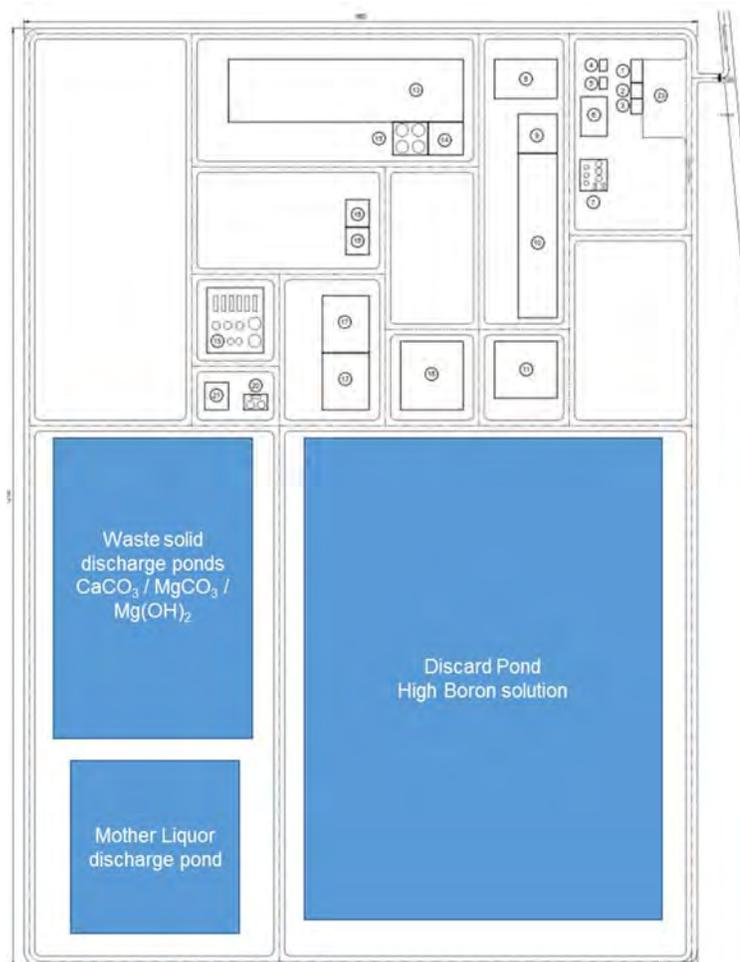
Lithium Carbonate Plant Layout - Tailings Dam Construction Location.
